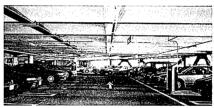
Internal view of parking lot in Sen City Park Plaza Building
